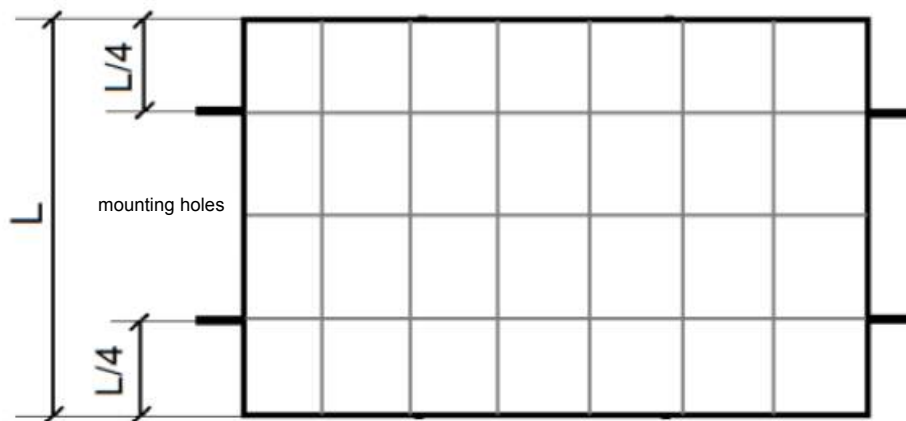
Proper mounting distances for modules operating horizontally (mounting holes)
